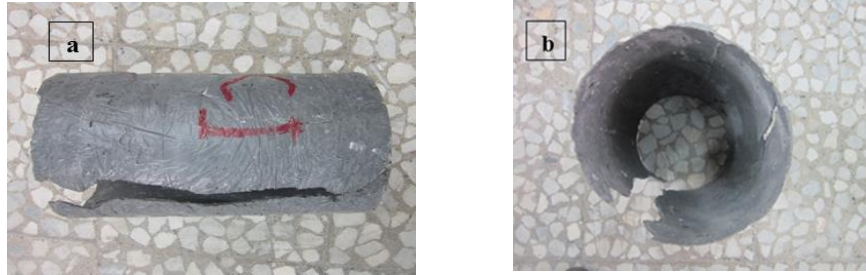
FRCM jacket detached from failed wrapped specimen (C-CM-1): (a) side view, (b) top view.
